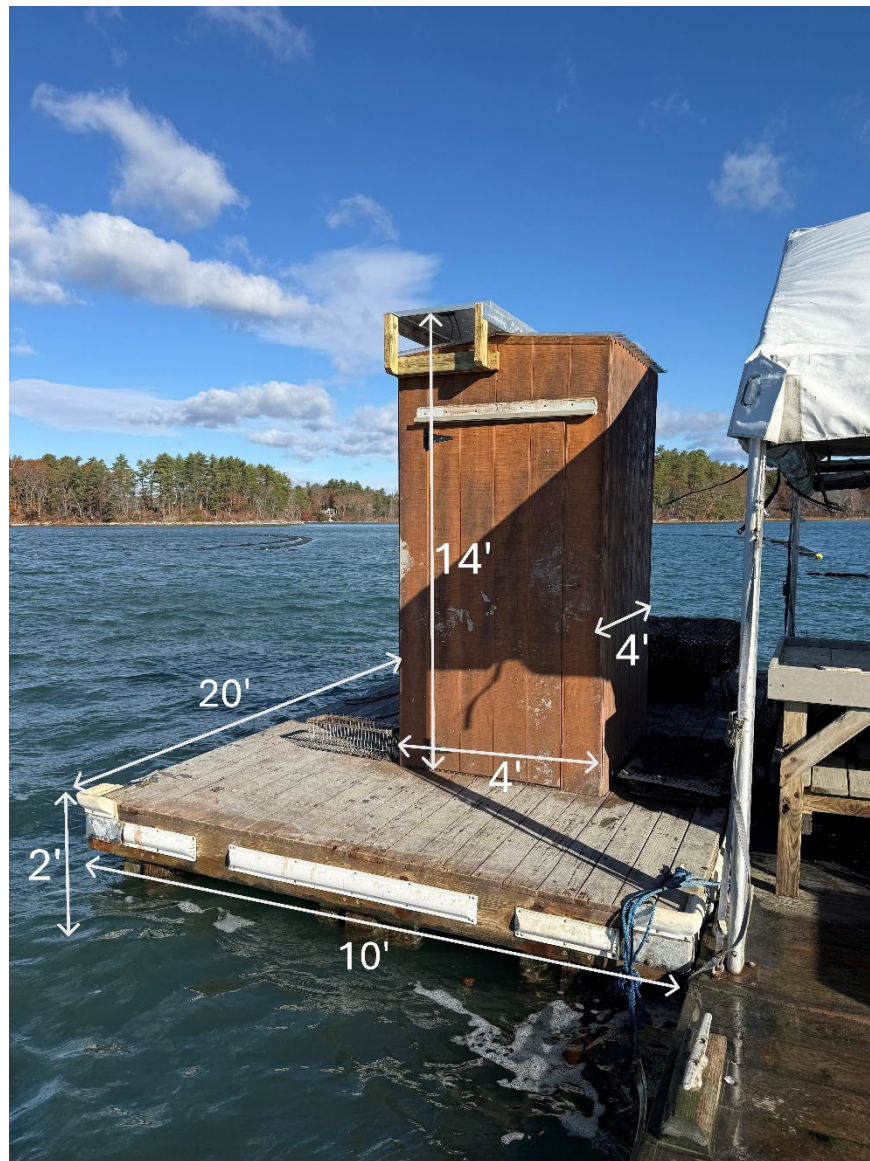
Picture of wooden outhouse building raft with outhouse building for Dodge Cove Marine Farm's proposed amendment. One outhouse raft and building would be added. The incinerator toilet is placed inside.
